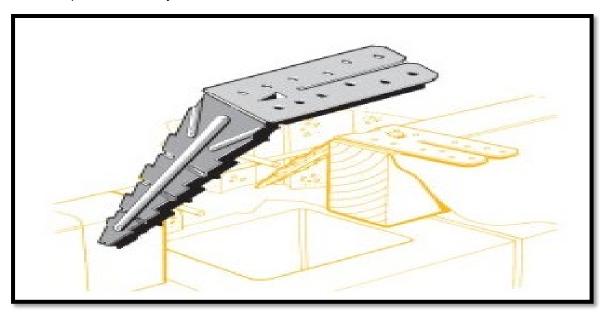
MiTek Lumberlok bottom plate fixing anchor
